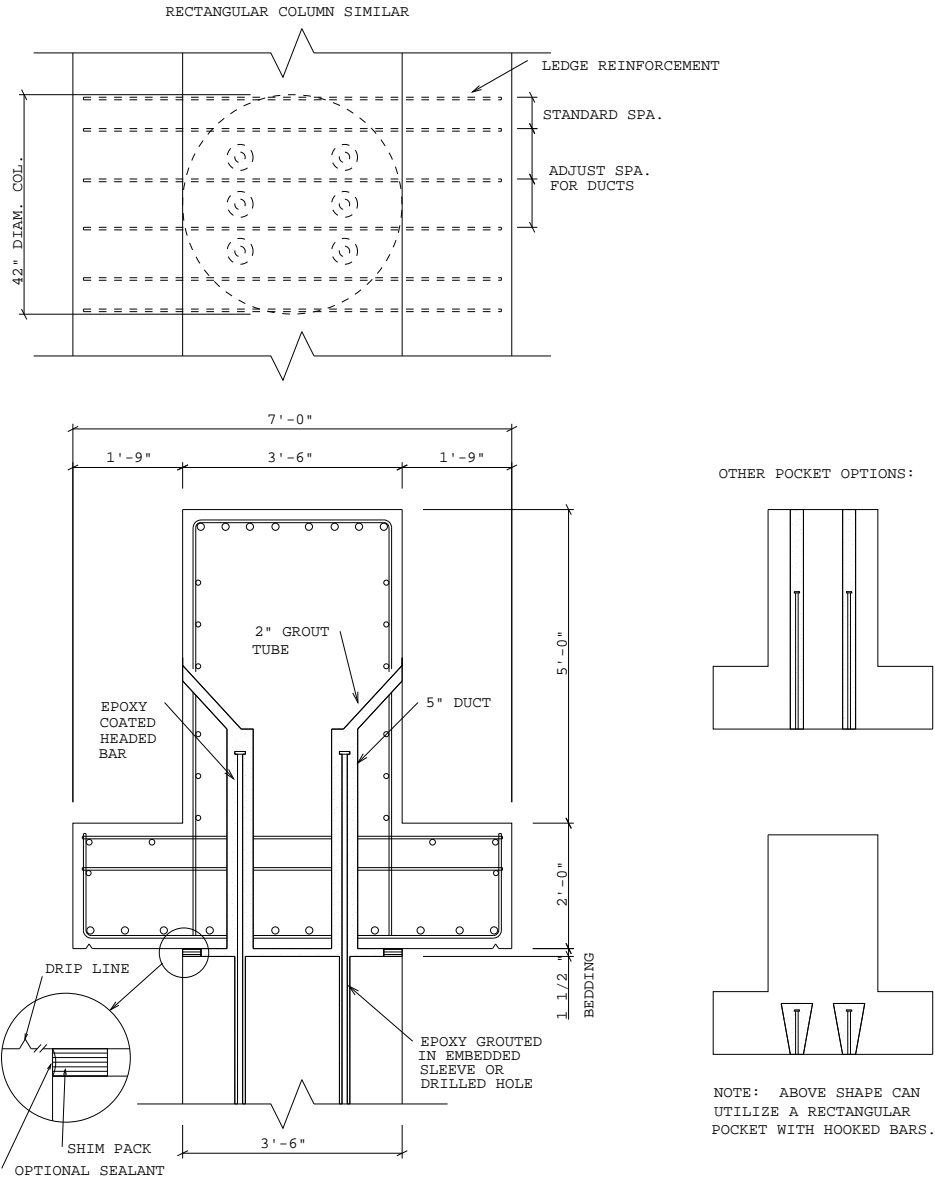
Inverted Tee Grout Pocket on Cast-in-Place Column
